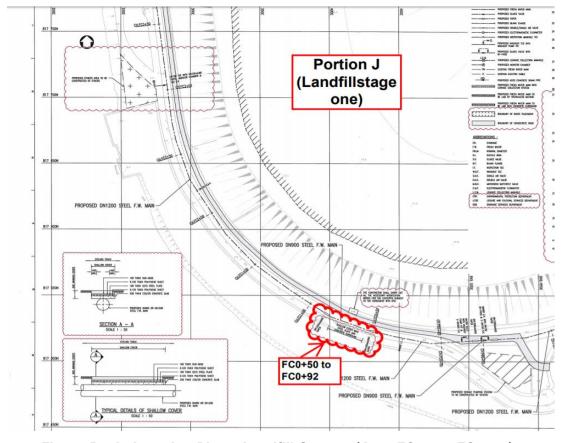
Location Plan – Landfill Stage 1 (Area FC0+50 -FC0+92)
